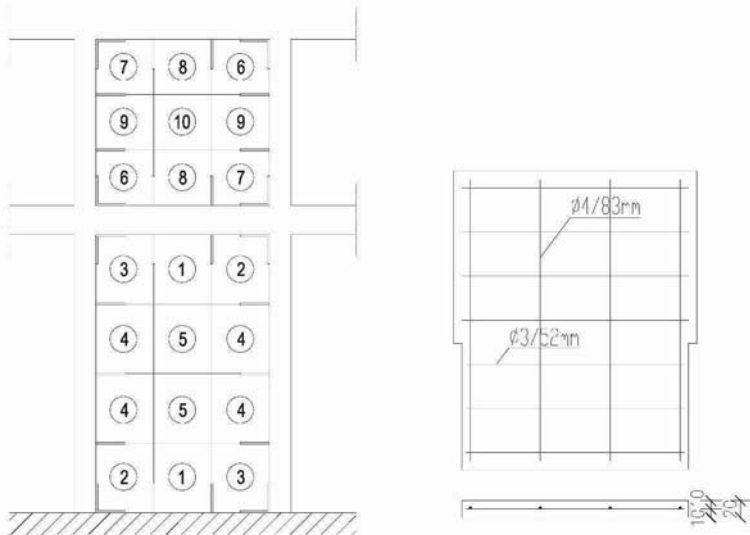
Arrangement of panels (left); typical panel reinforcement (right)
